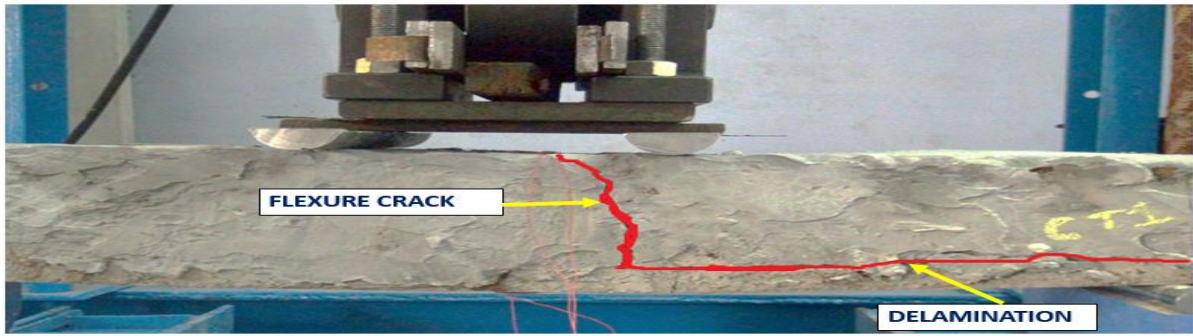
Delamination of tension strengthened masonry beam with cement mortar as bonding agent
